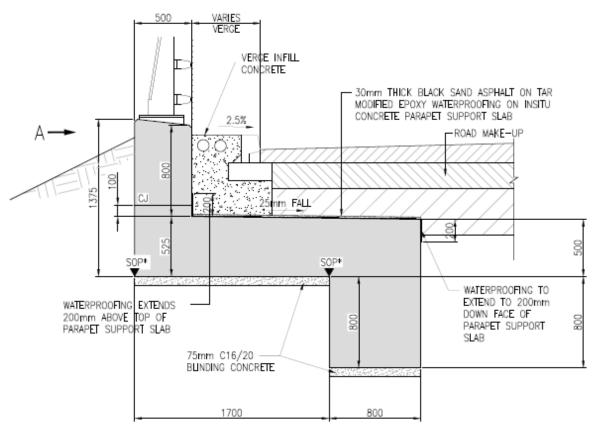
(a) – Typical Restraining Slab Detail off Bridge Deck
